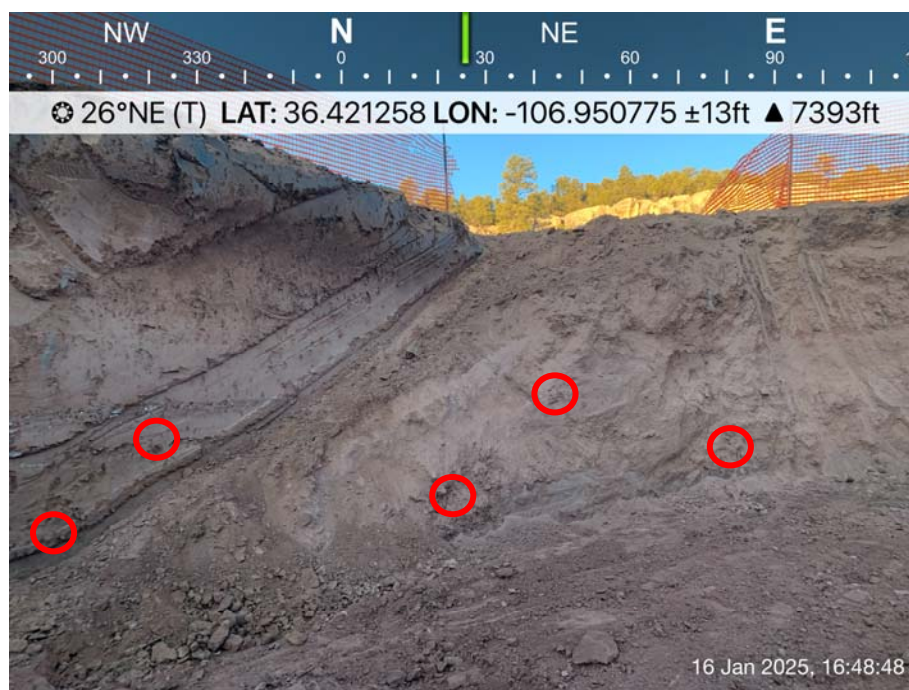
SS14 collected as a five-point composite sample 4-10 ft bgs from northeast sidewall of excavation.
